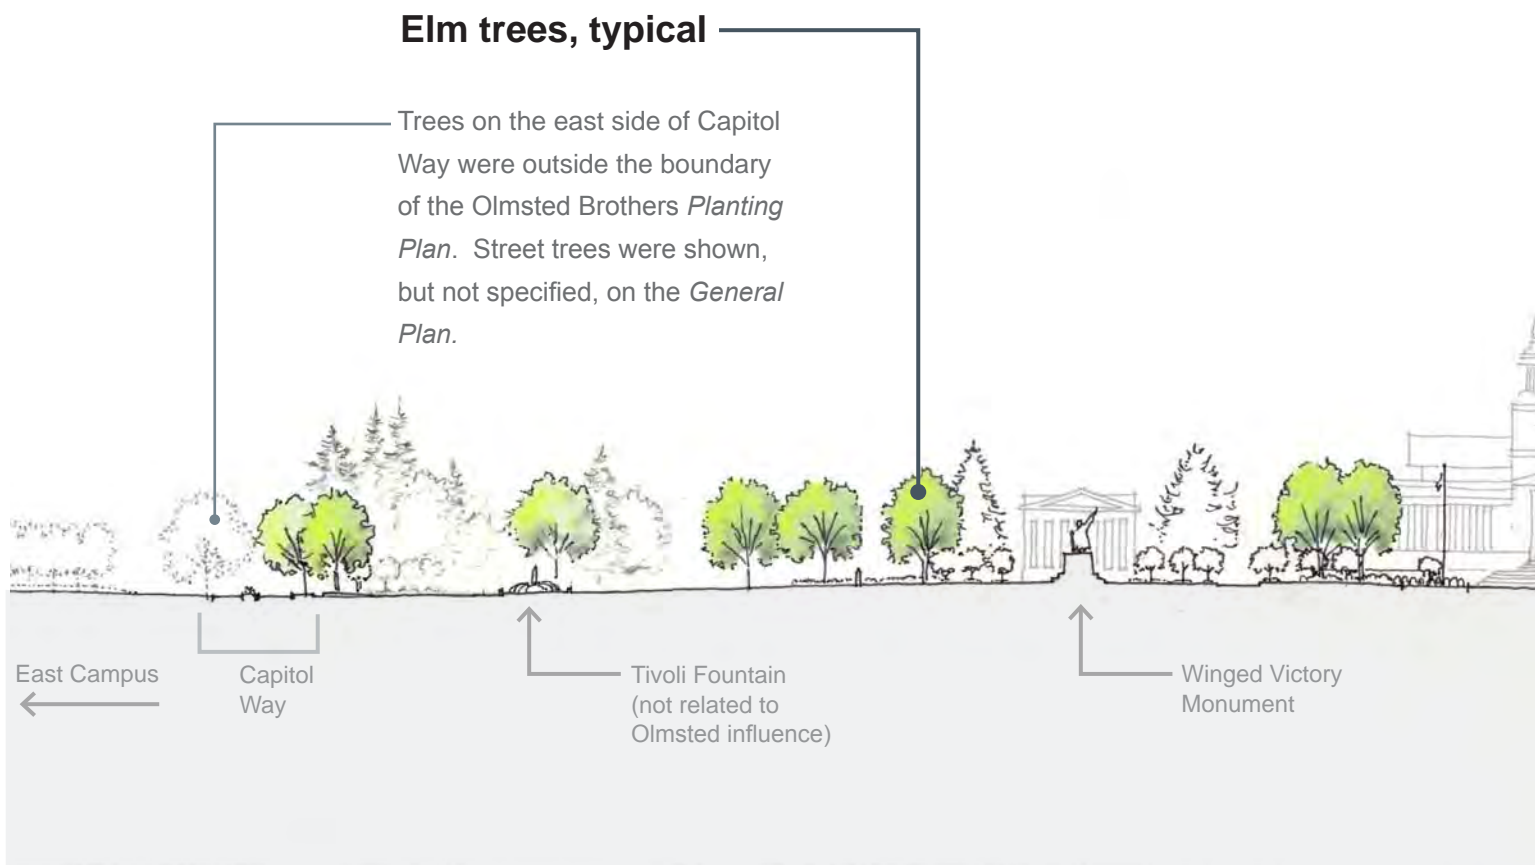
Campus Section highlighting Elm Trees shown in 1929 Olmsted Brothers Planting Plan
